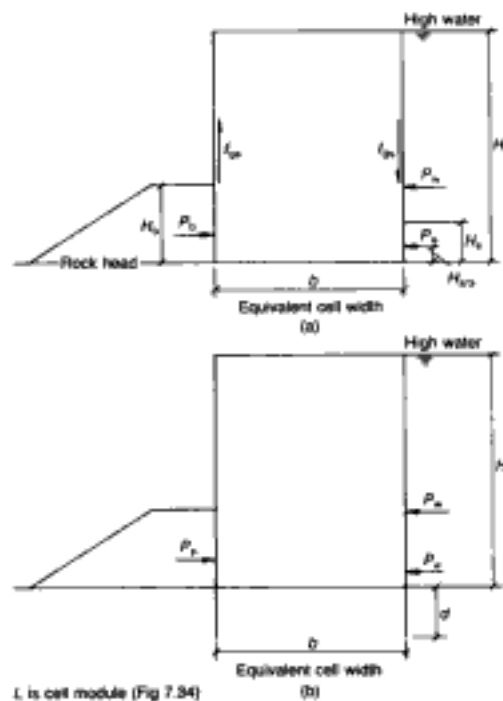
Piling rise and pile pull-out calculations for circular cofferdams: (a) founded on rock; (b) founded in sand and clay
